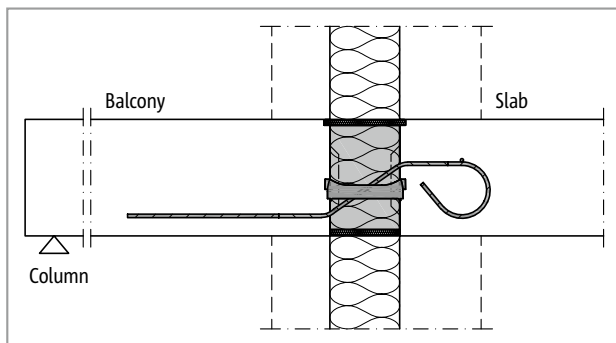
Schöck Isokorb® XT type Q: Connection with single wall, thermally insulating masonry (XT type Q-V1 to V4)
